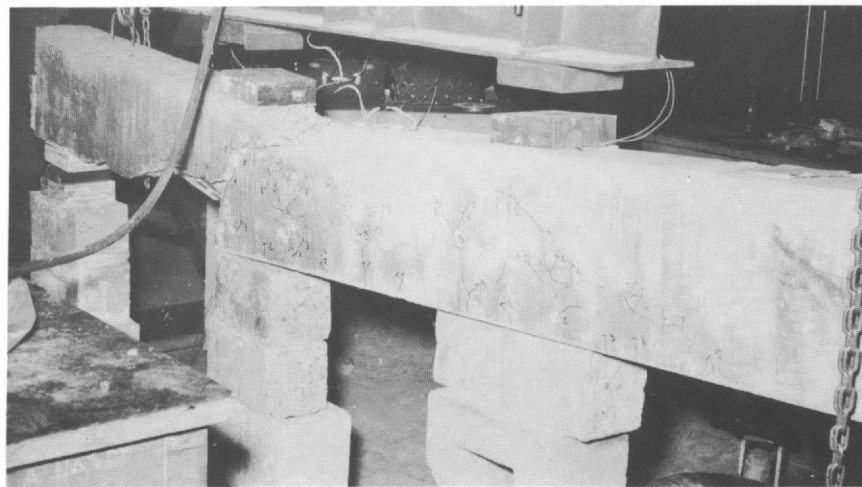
VIEWS OF BEAMS AFTER TESTING
